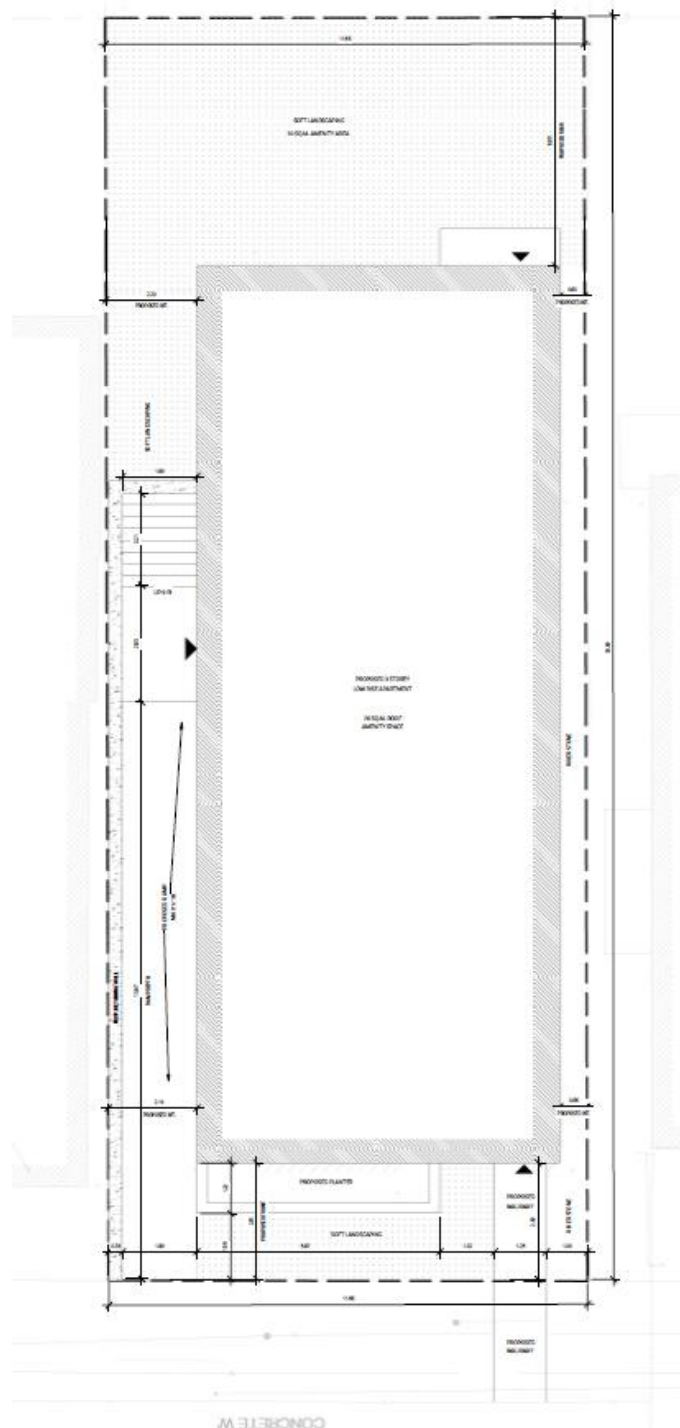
Site plan of the proposed development illustrating setbacks and hard and soft landscaping Note the proposed concrete retaining wall. Source: Evolution Design October 2019.
